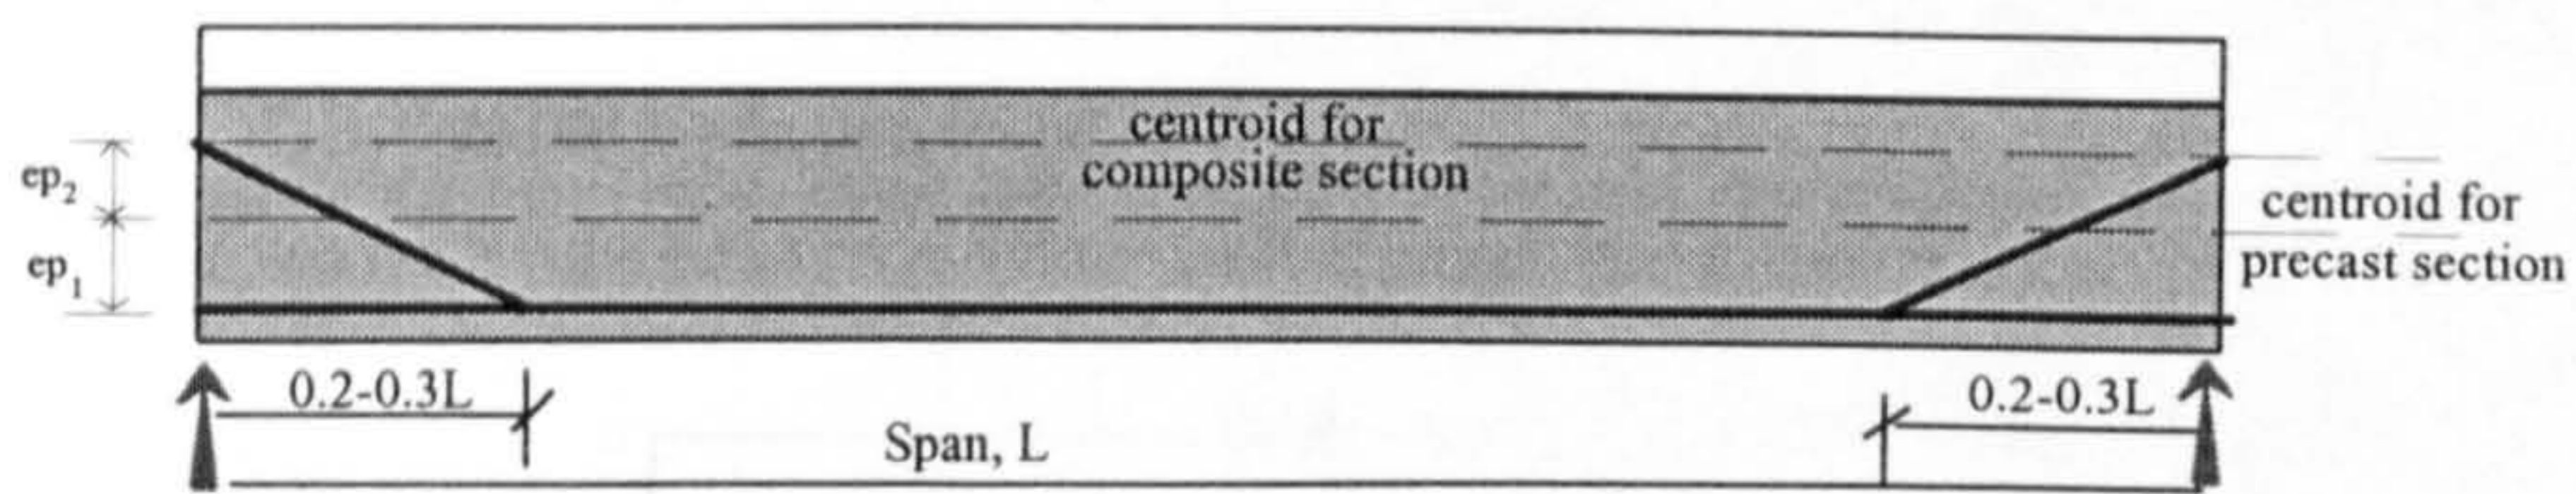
General tendon layout for pretensioned steel in precast beams
